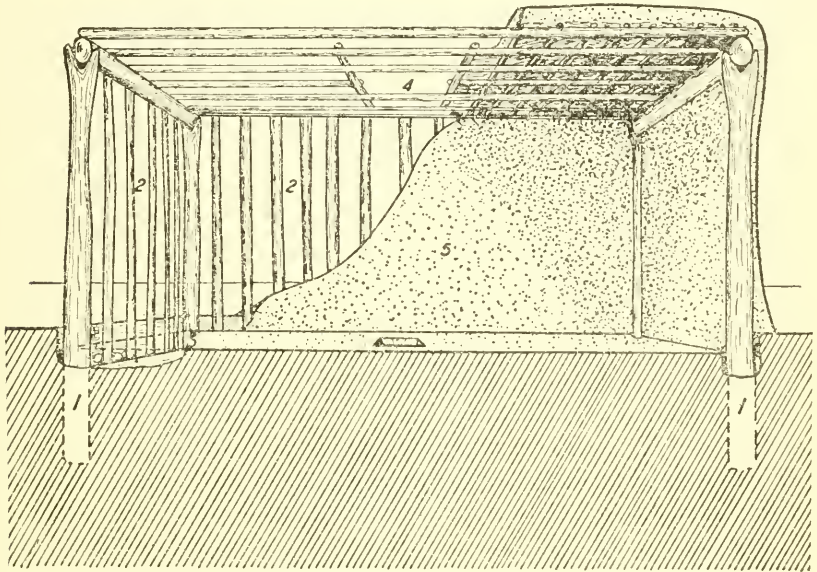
Postulated construction in the B type houses. 1, Main support posts; 2, Small wall poles; 3, Roof timbers; 4, Opening for smoke hole; 5, Plastered wall
